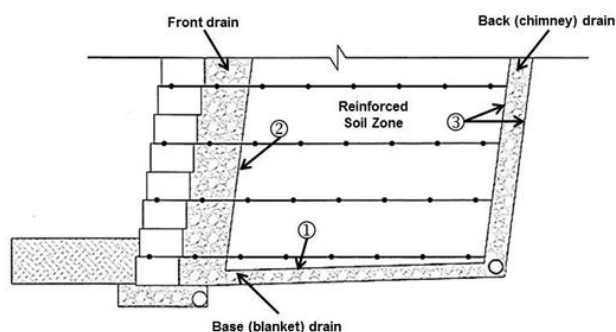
Base, Front and Back Drainage Locations (mod. from National Concrete Masonry Association, Herndon, VA, Pub. No. TR308, 2016)
